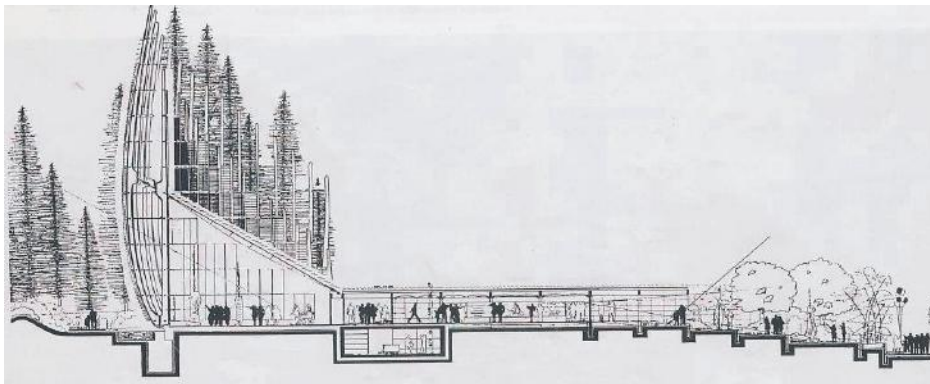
East West section through case and gallery illustrating double skin construction, cross ventilation and surrounding norfolk pine trees (Source- McInstry: 1998, 32)
